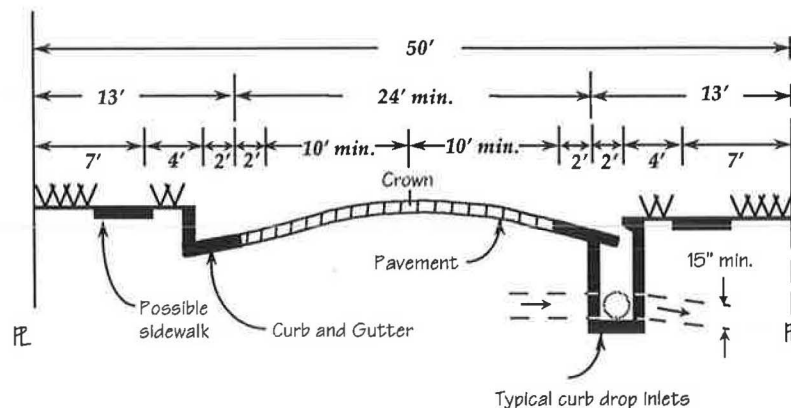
Cross section of typical urban local street, curb-and-gutter section (not to scale).
